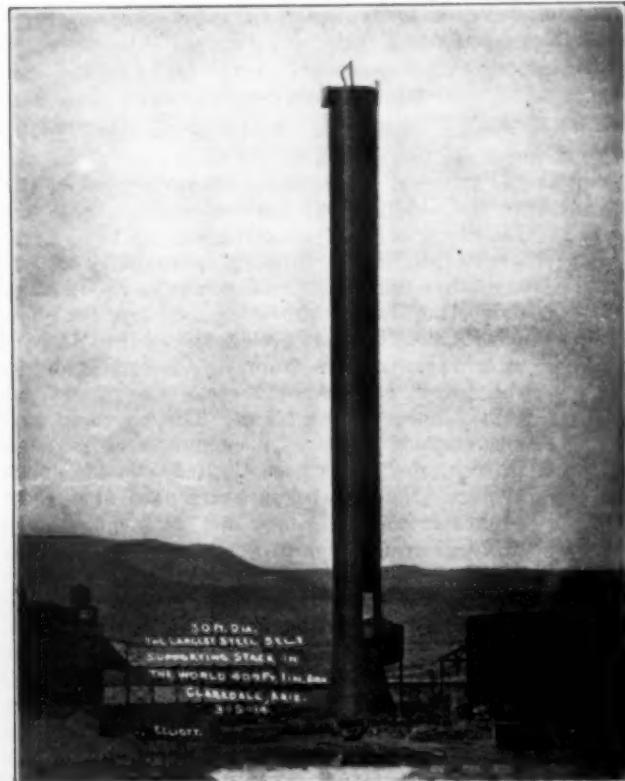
400-FT. STEEL STACK, UNITED VERDE SMELTER
